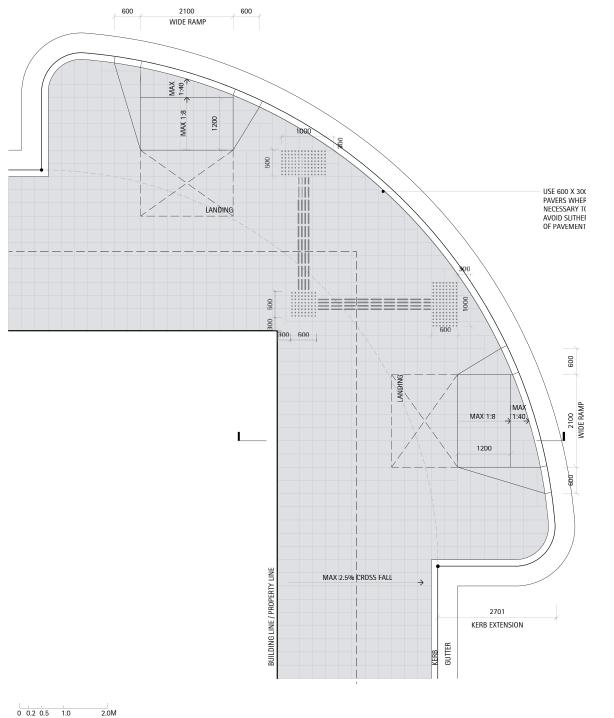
Streets Corner Plan: Kerb Extensions 2100 Ramp
